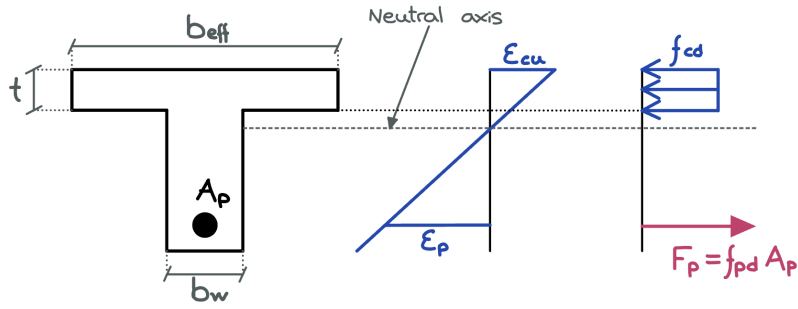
Strains and stresses in a T-section with only prestressing reinforcement.
